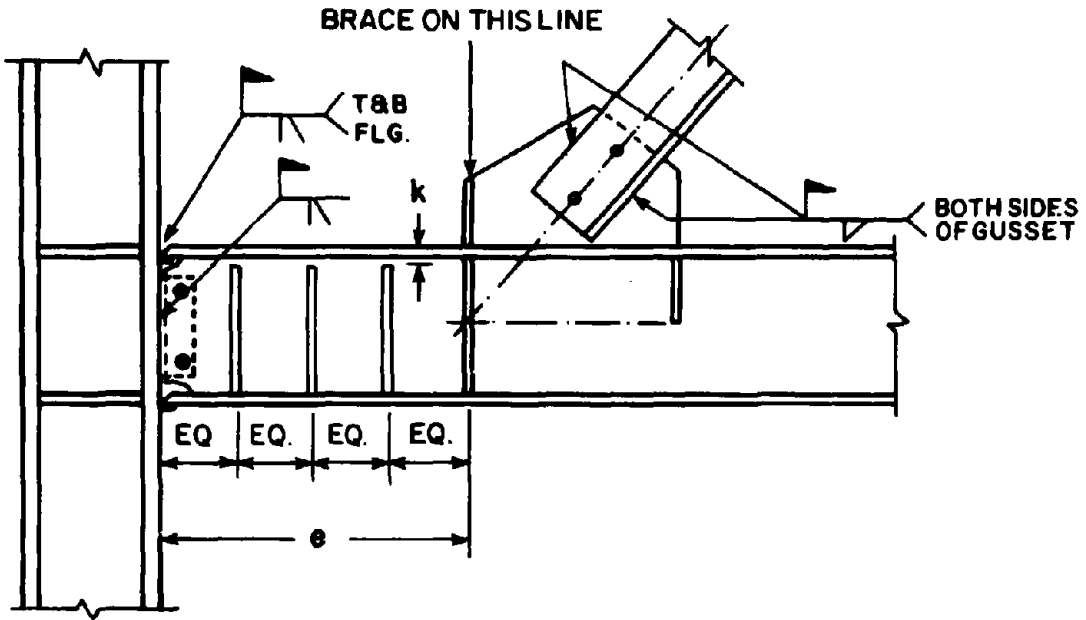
All-Welded Link-Column Flange Connection with Full Penetration Web Weld Showing Suggested Stiffener Spacing.
